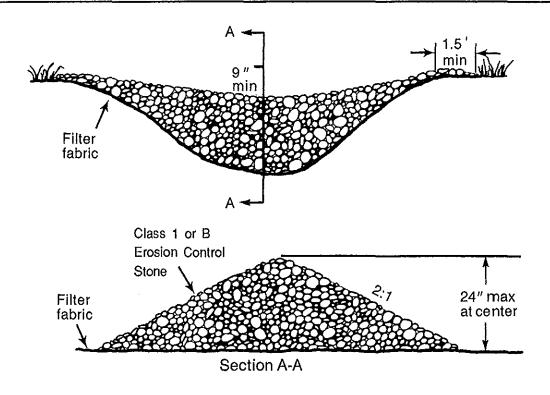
Stone check dam-Stone should be placed over the channel banks to keep water from cutting around the dam.
